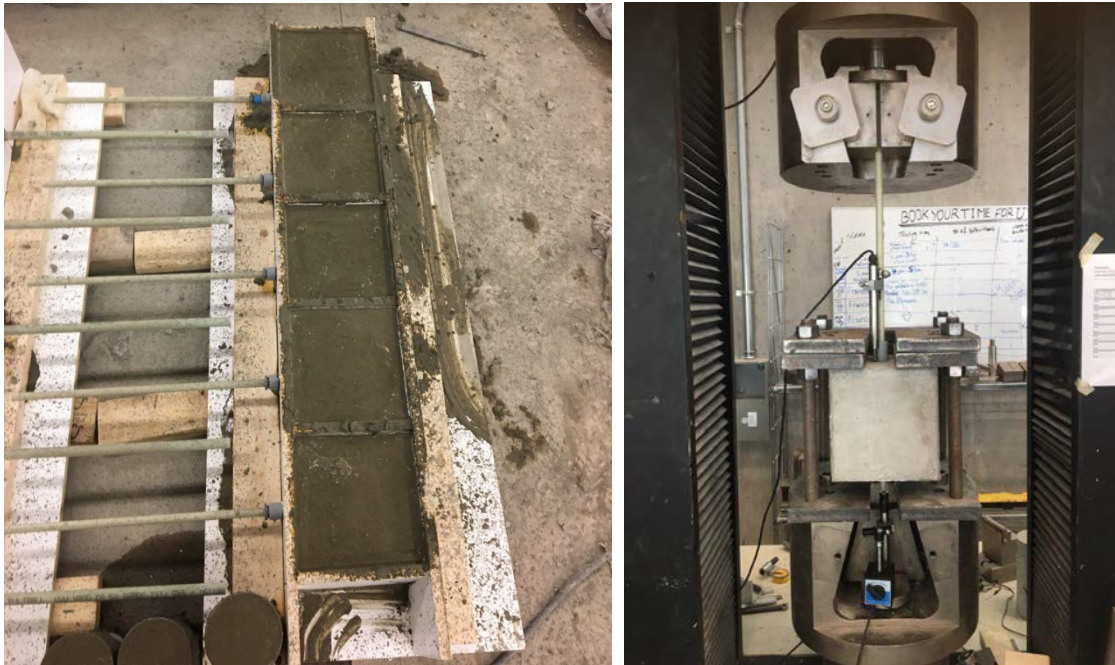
(left): Specimen fabrication, and 1b (right): test setup
